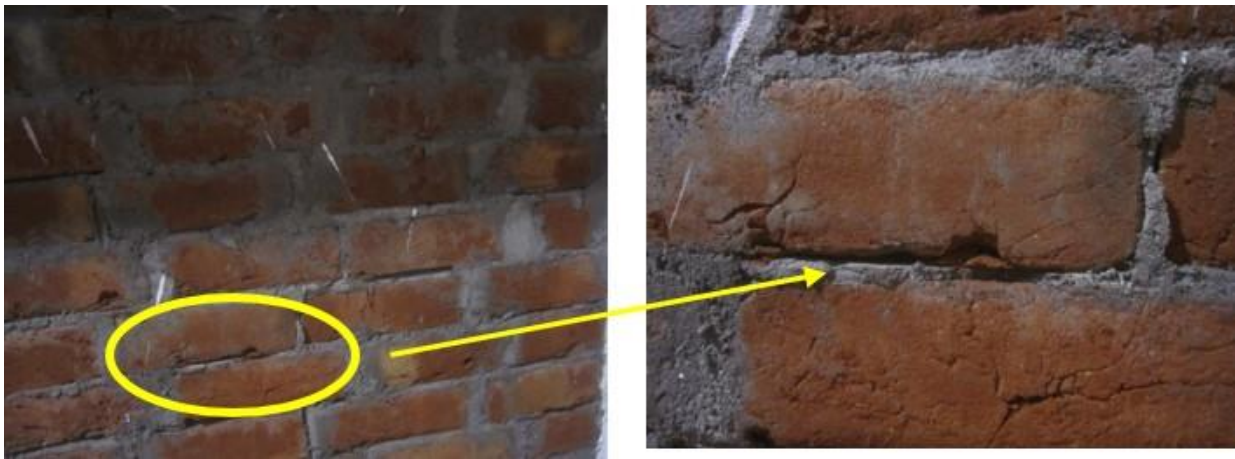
10: Failure of Specimen “B” (a) Plaster delamination in brick masonry; (b) magnified view of the brick delamination with plaster and cracks developing in brick due to loading.
